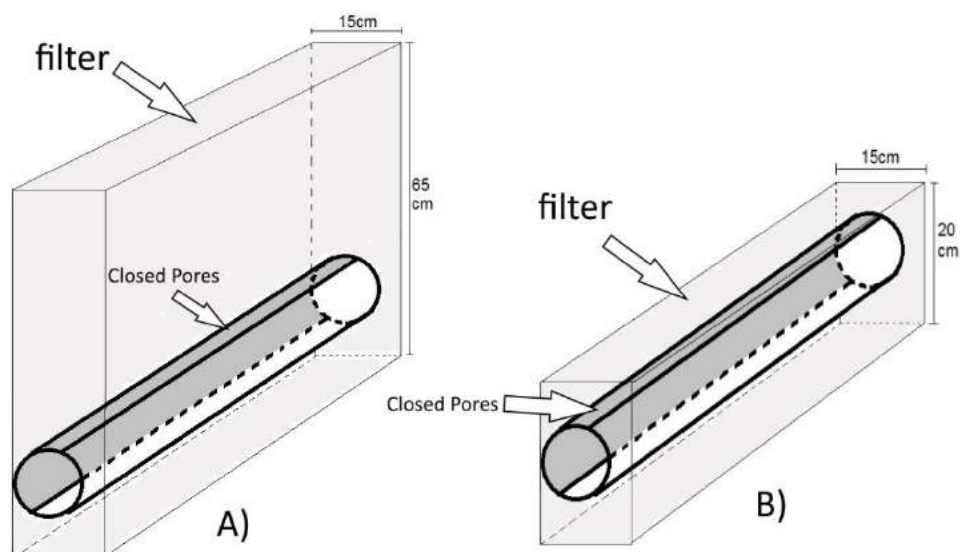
A) Trench drainage dimensions B) Subsurface drainage Dimensions
